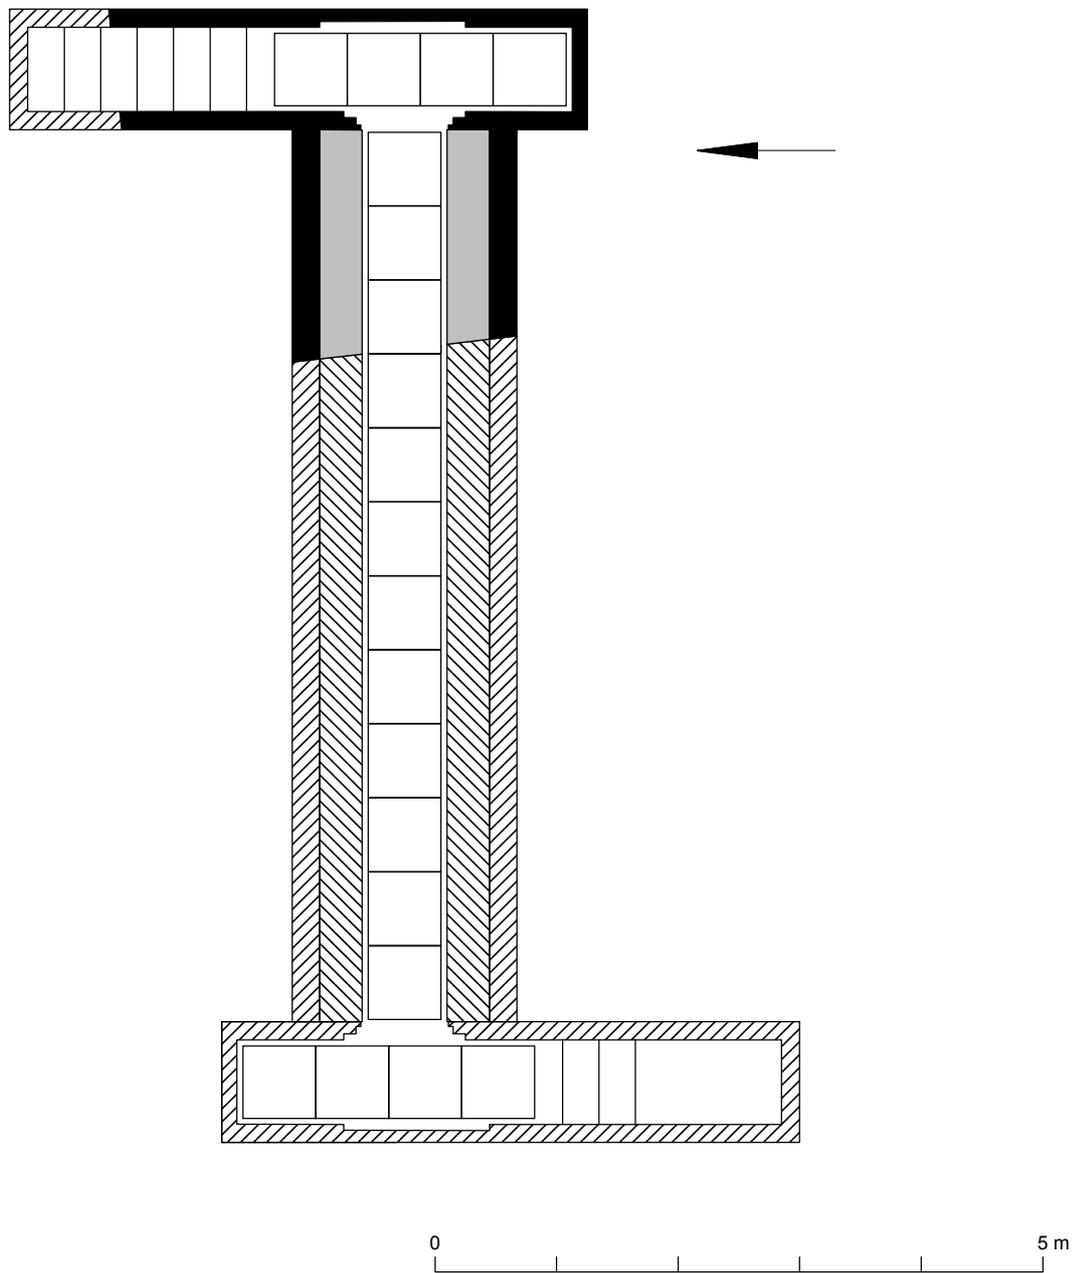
Development Area 7: air-raid shelter WBF83 - plan.
